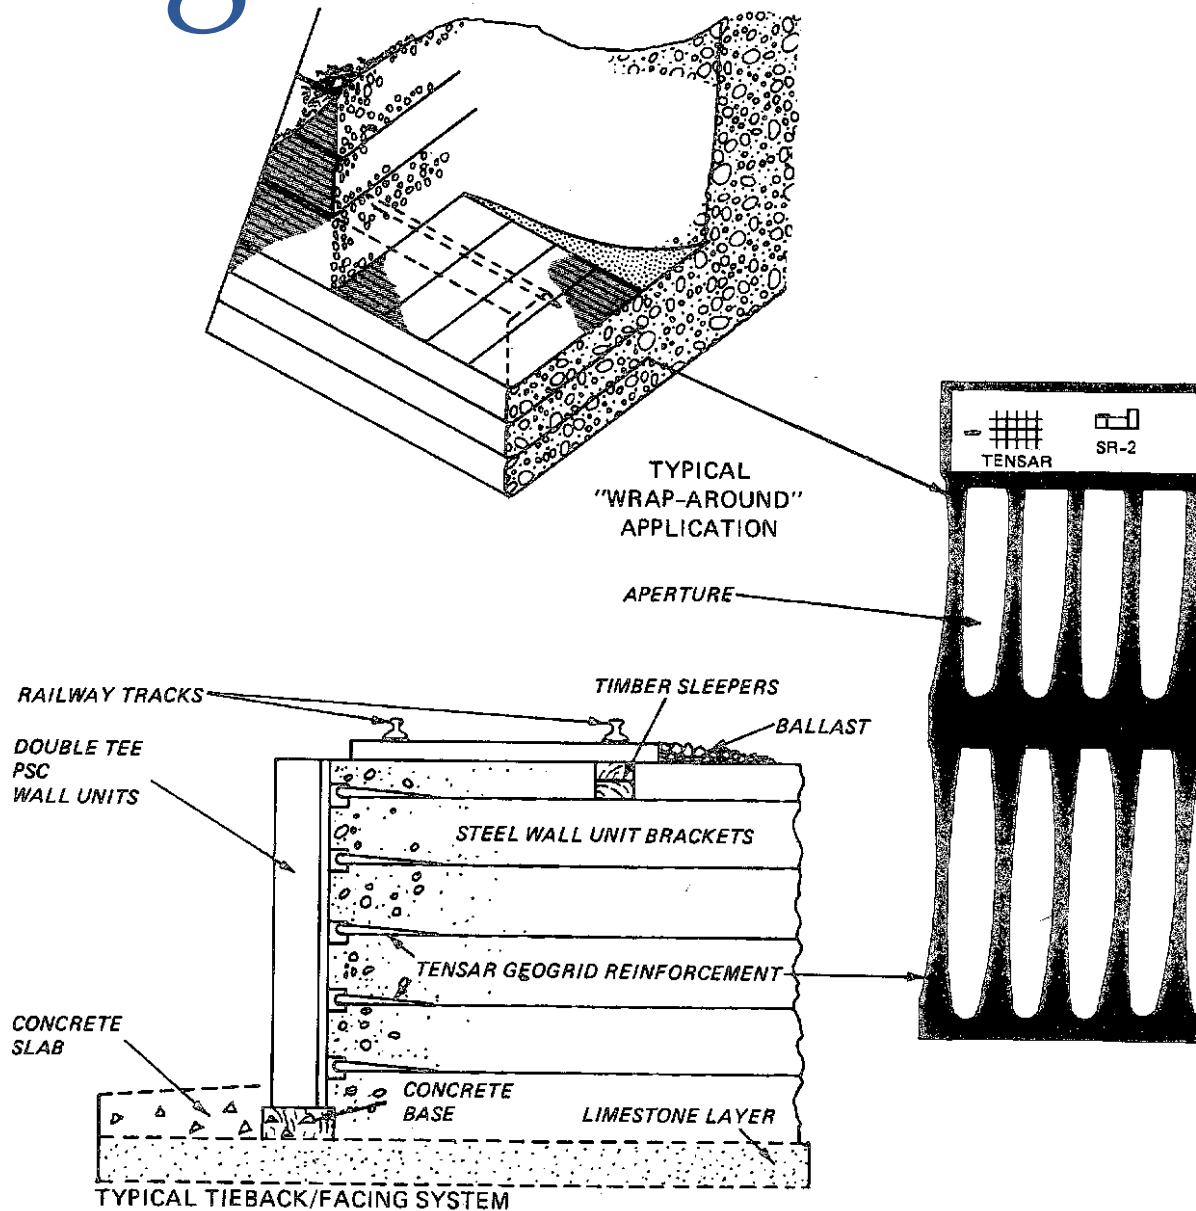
Schematic diagram of reinforced earth retaining wall
